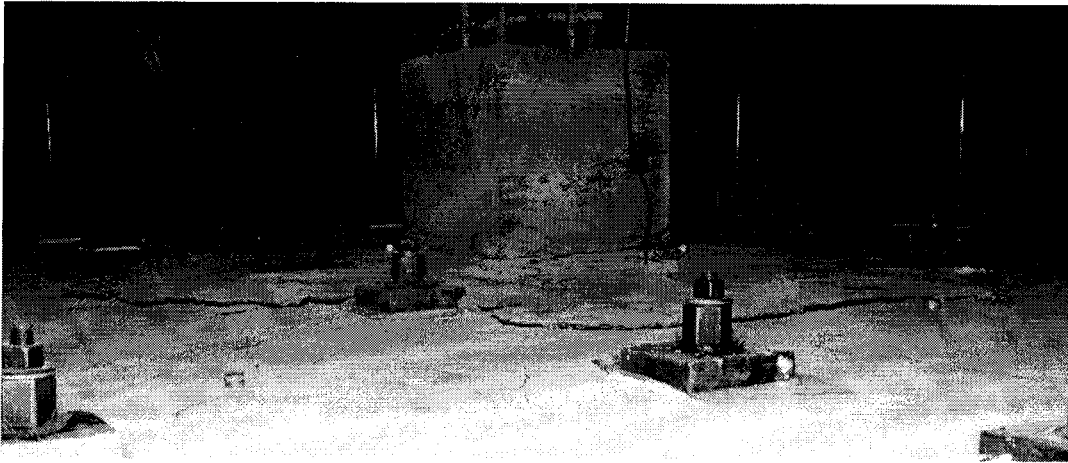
Crack Pattern at failure : ER3-CS2
